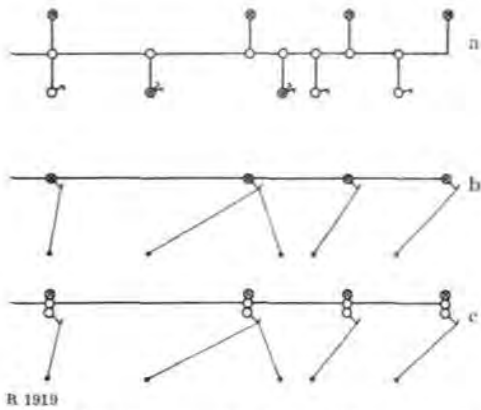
Wiring of a modern farmstead. The cables are carried on a board underneath the eaves from the distributing station.
